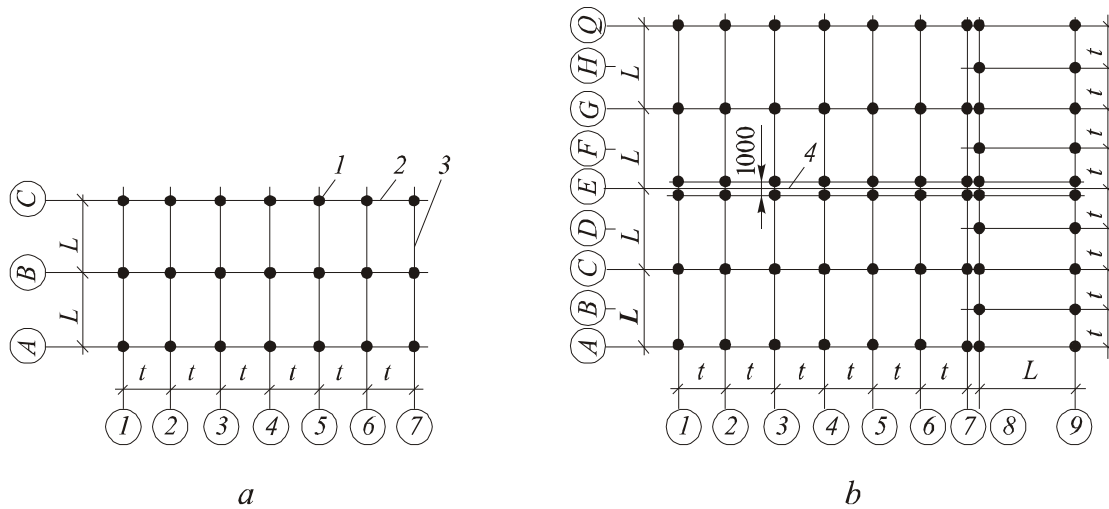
Layouts [1]: *a* – a double-span building; *b* – a building consisting of four parallel spans and one lateral span; 1 – a column; 2 – a longitudinal laying out axis; 3 – a lateral laying out axis; 4 – expansion joint
